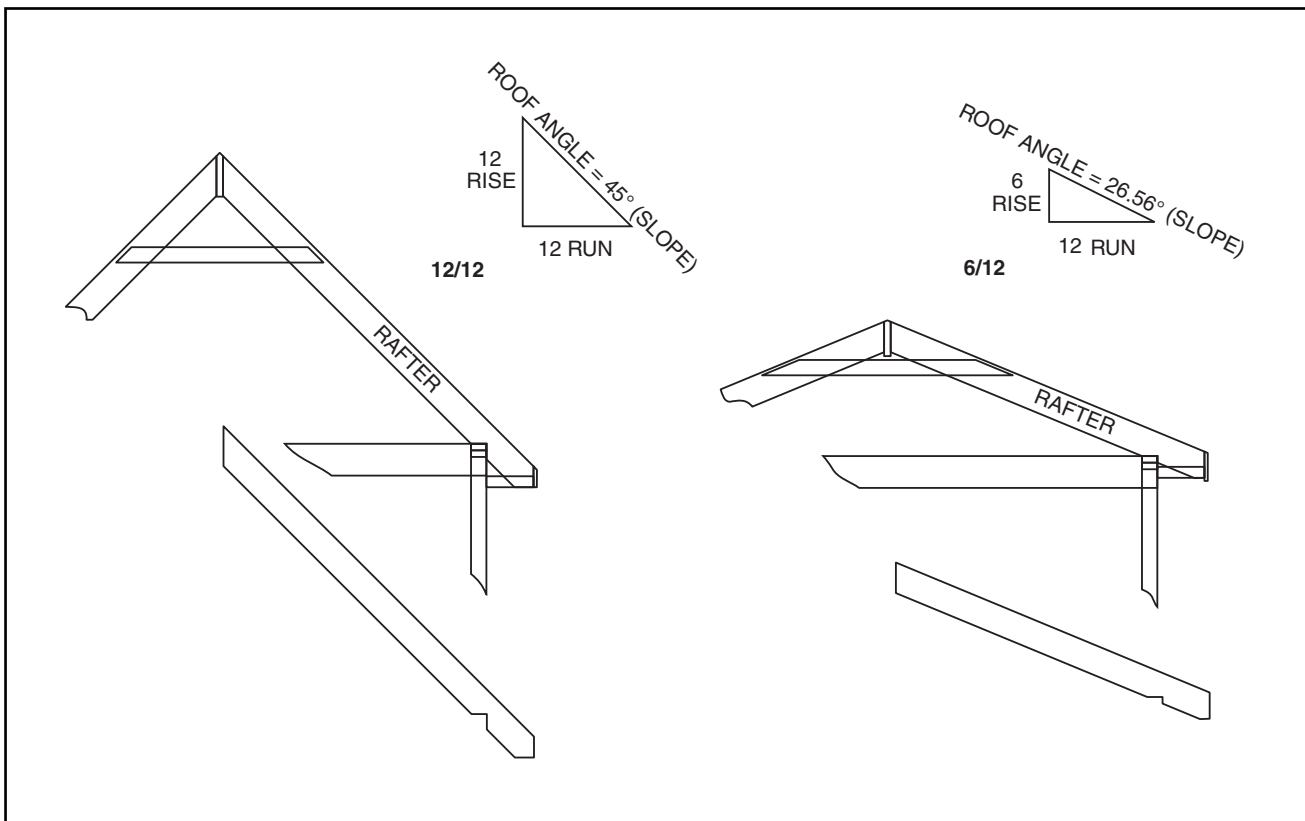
Pitch Angle Cutting – Common Roof Rafters
